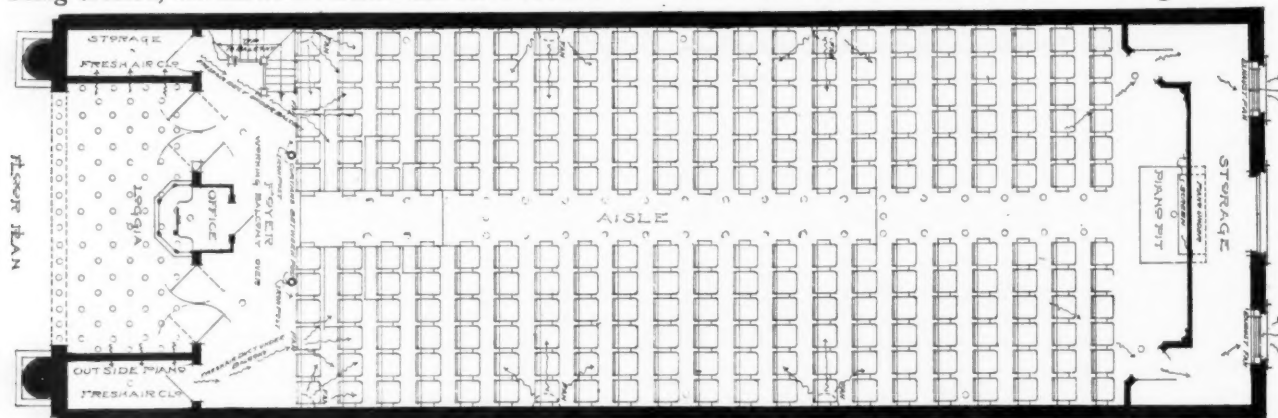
Floor Plan showing Also Arrangement of Lights and of Ventilators
